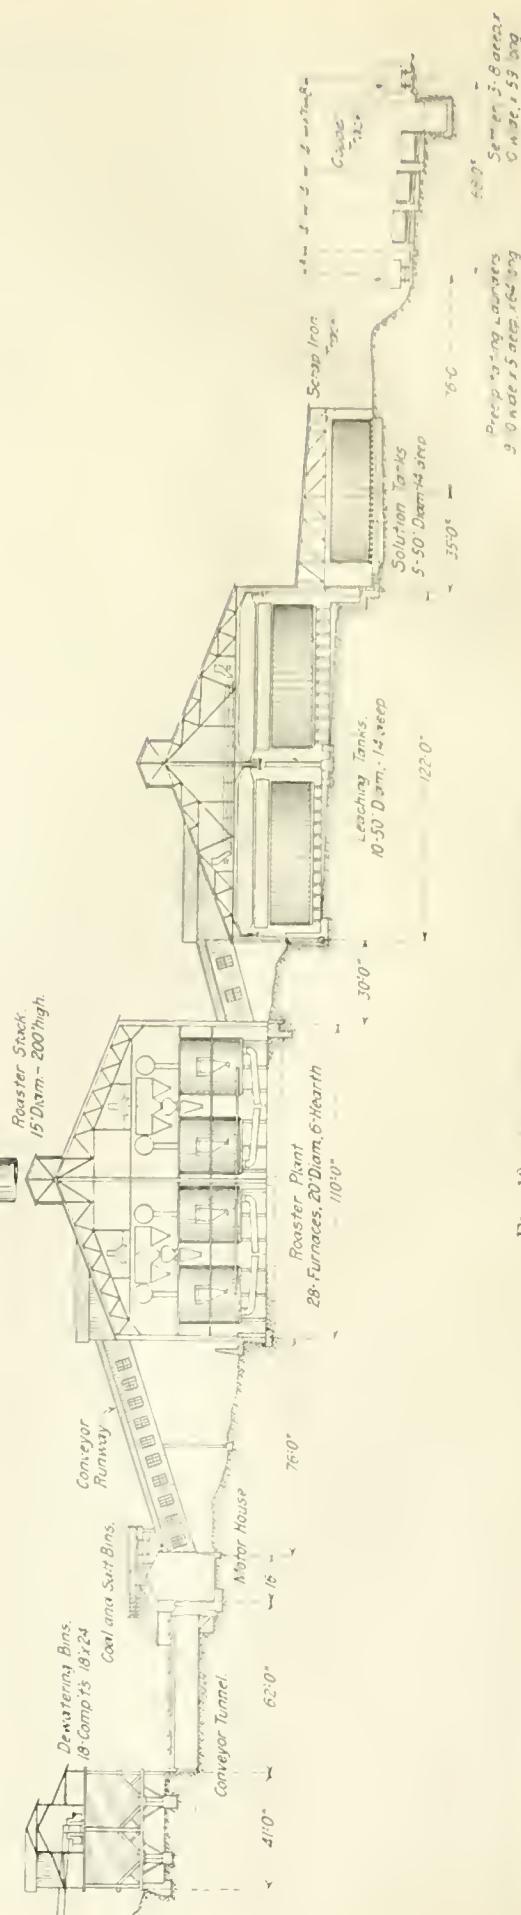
SECTIONAL ELEVATION OF LEACHING PLANT.
